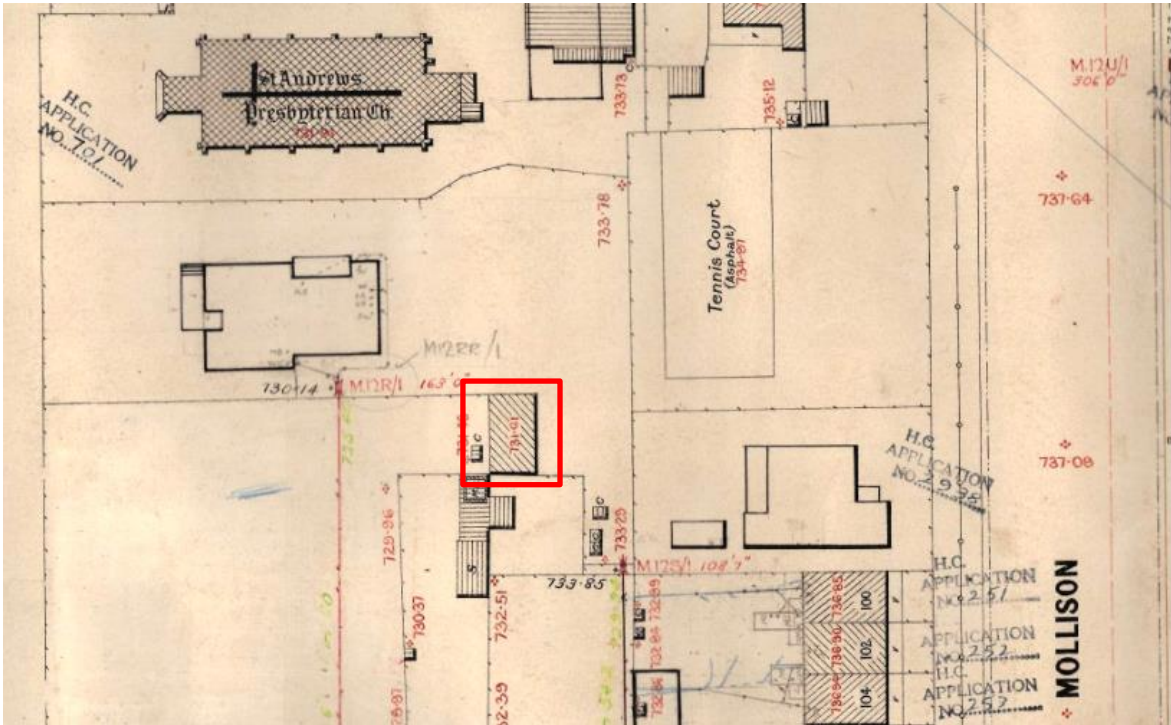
Stable building (outlined in red) shown on the 1923 Bendigo Sewerage Authority Plan. Note adjoining timber stables with manure bin. The drawing has been altered to show the 1968 manse but retains the 1859 stone church. (Source: Bendigo Sewerage Authority Deetail Plan No. 21, 1923)
